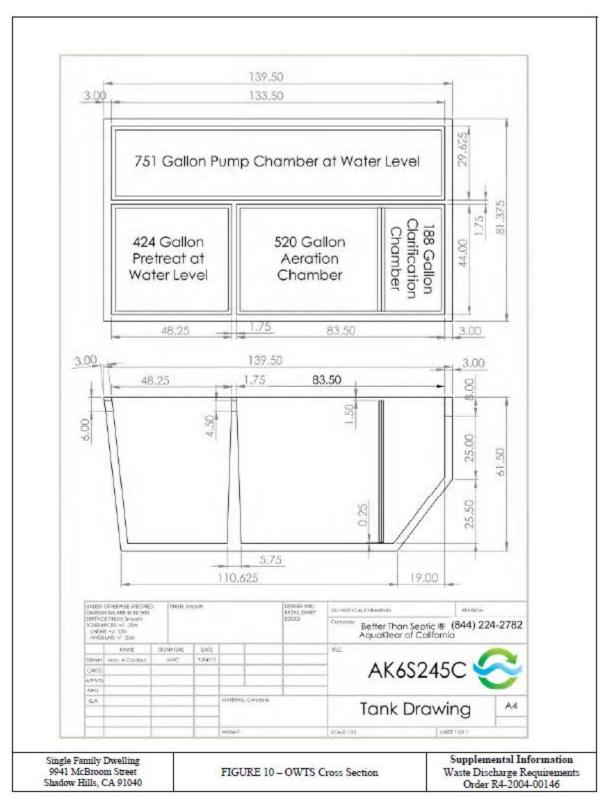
Cross Section of the Advanced Onsite Wastewater Treatment System
